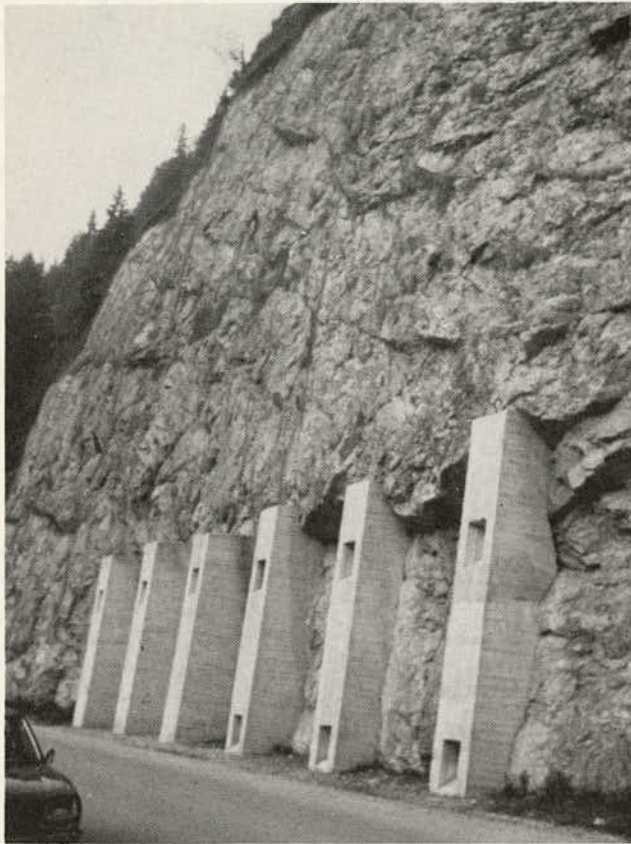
Cast-in-place reinforced concrete buttress approximately 15 m (50 ft) high providing stabilization support against possible movement of large block above overhang (note unfavorable discontinuities in the slope).
